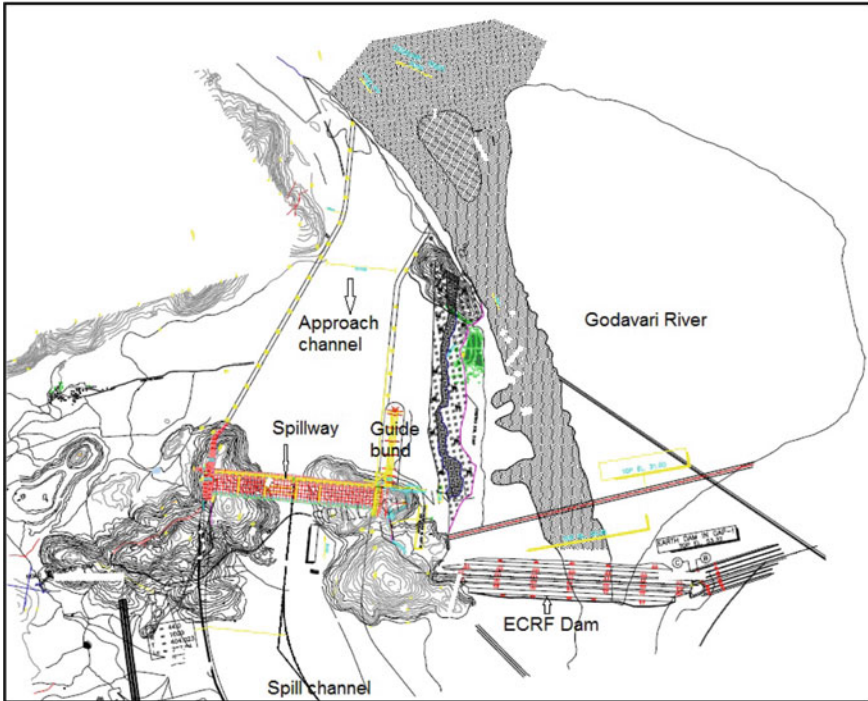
Plan of layout of the project comprising modified approach channel, guide bund and dump hill
